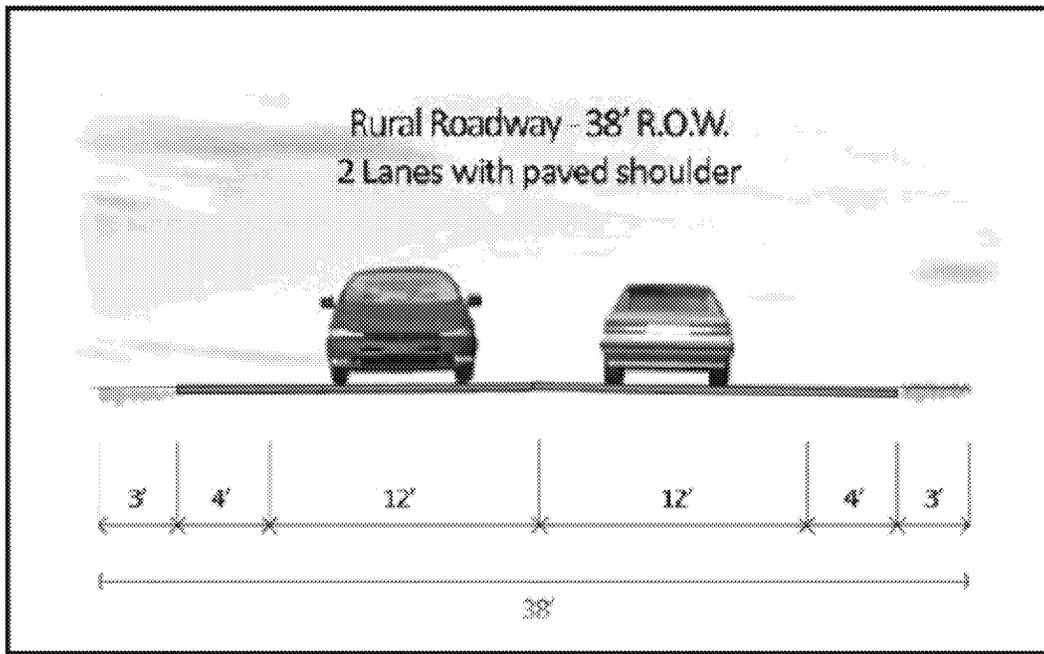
Roadway Cross Section Considered to Date - Colusa County Rural Roadway
